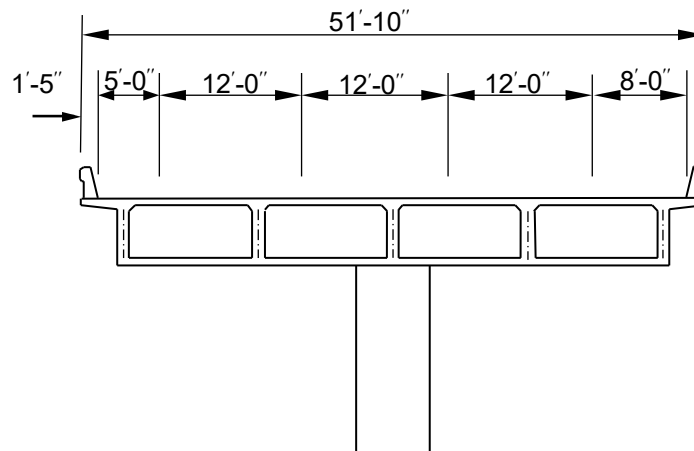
Example Bridge Typical Section for Substructure Calculations
